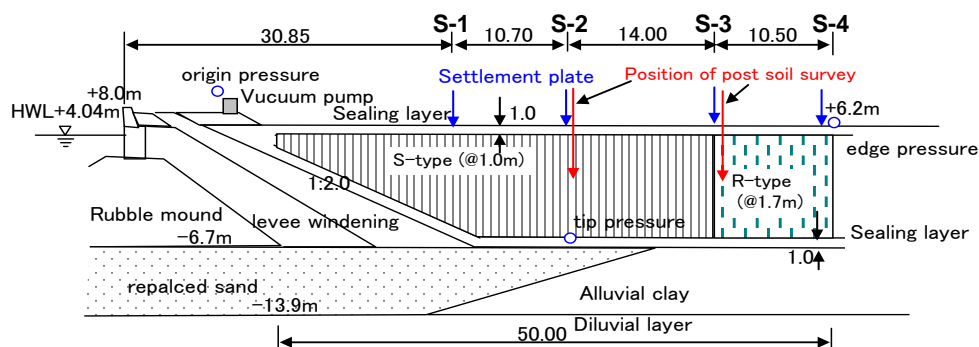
Design of ground improvement and monitoring plan in vacuum consolidation
